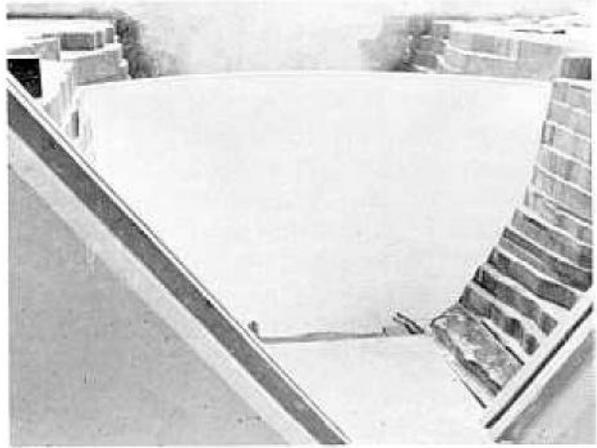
Structural model of Glen Canyon Dam.—PX-D-43725 NA
